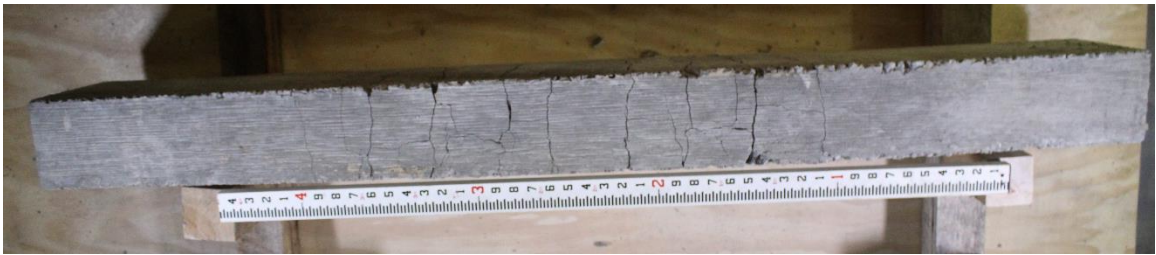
Mixture 7 (20W) beam #30: concrete beam bottom view.
